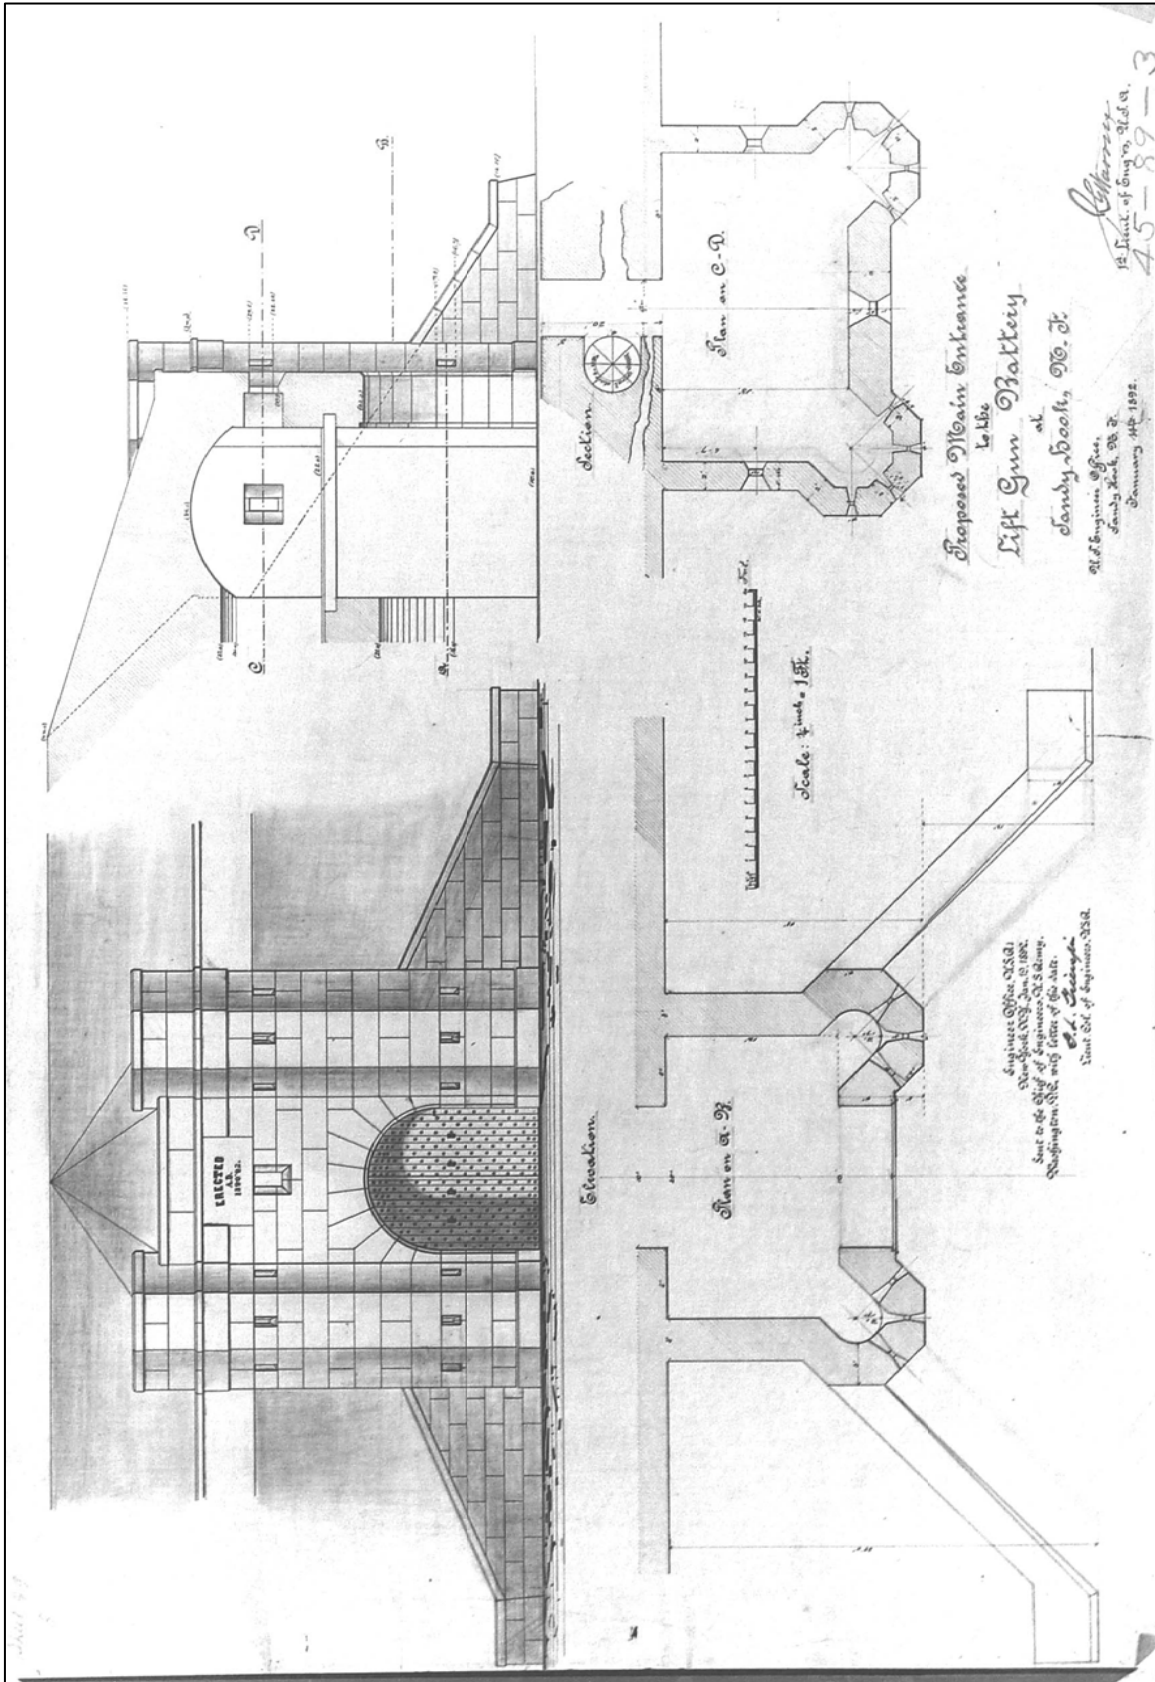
"Proposed Main Entrance to the Lift Gun Battery at Sandy Hook, N.J." Plans, elevation, and section of defensible entrance for Battery Potter, prepared by 1st Lt. J.G. Warren, Jan. 14, 1892.
